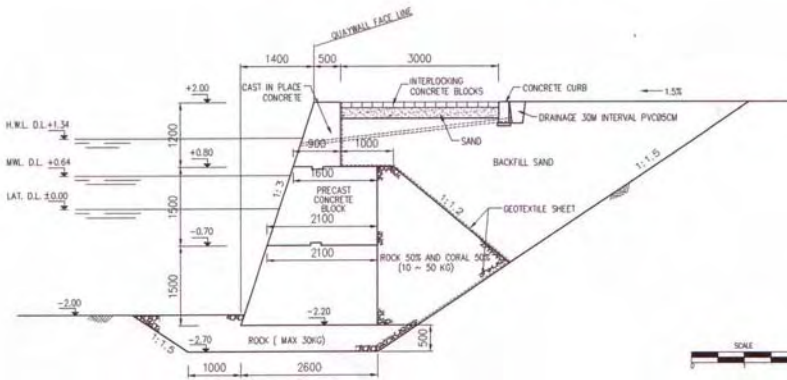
Partial Reconstruction Plan of Quaywall (Depth: D.L.-2.00)
